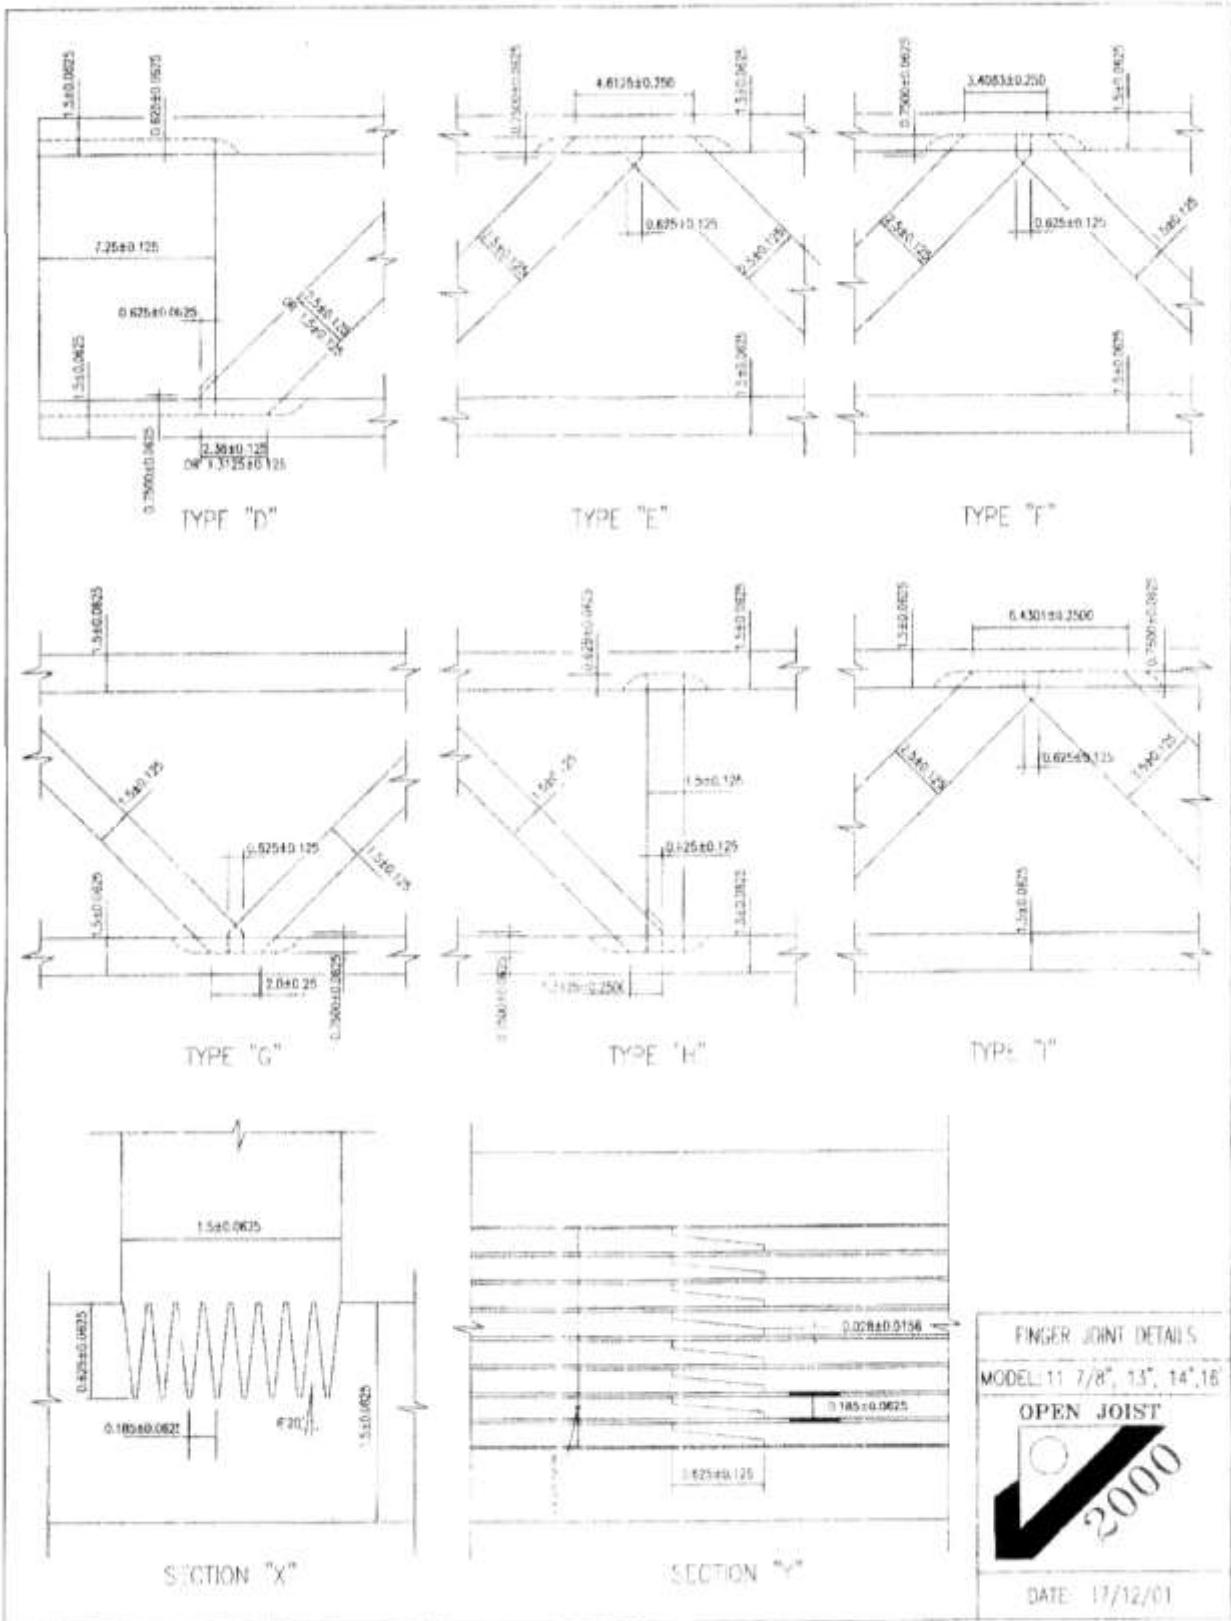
TYPICAL TRUSS DETAILS (Continued)
